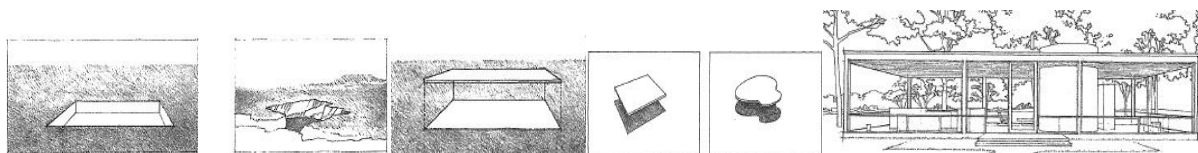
a) Depressed Base Plan, b) Overhead Plane, c) Glass house
